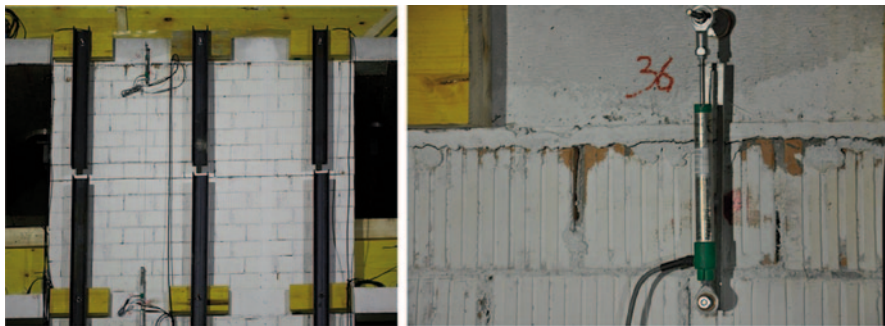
Out-of-plane failure of URM wall: horizontal cracks at mid height and at the top of the wall
